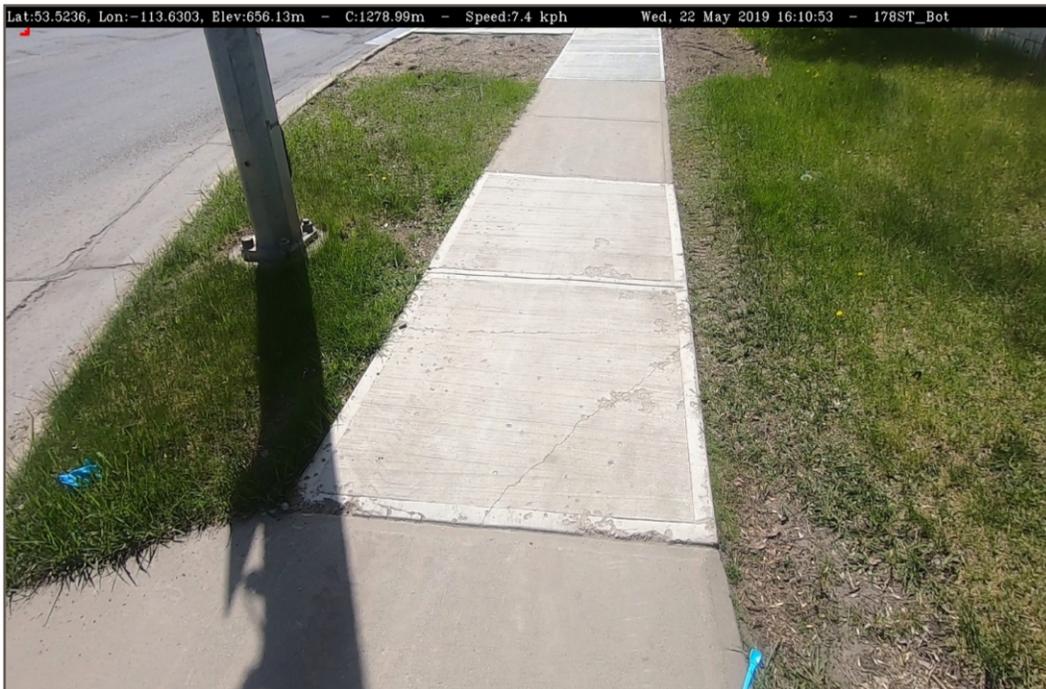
178 Street. 2019 photo. Appears the two replacement concrete panels were poorly constructed. Newer concrete 2 panels up appear in good condition.
